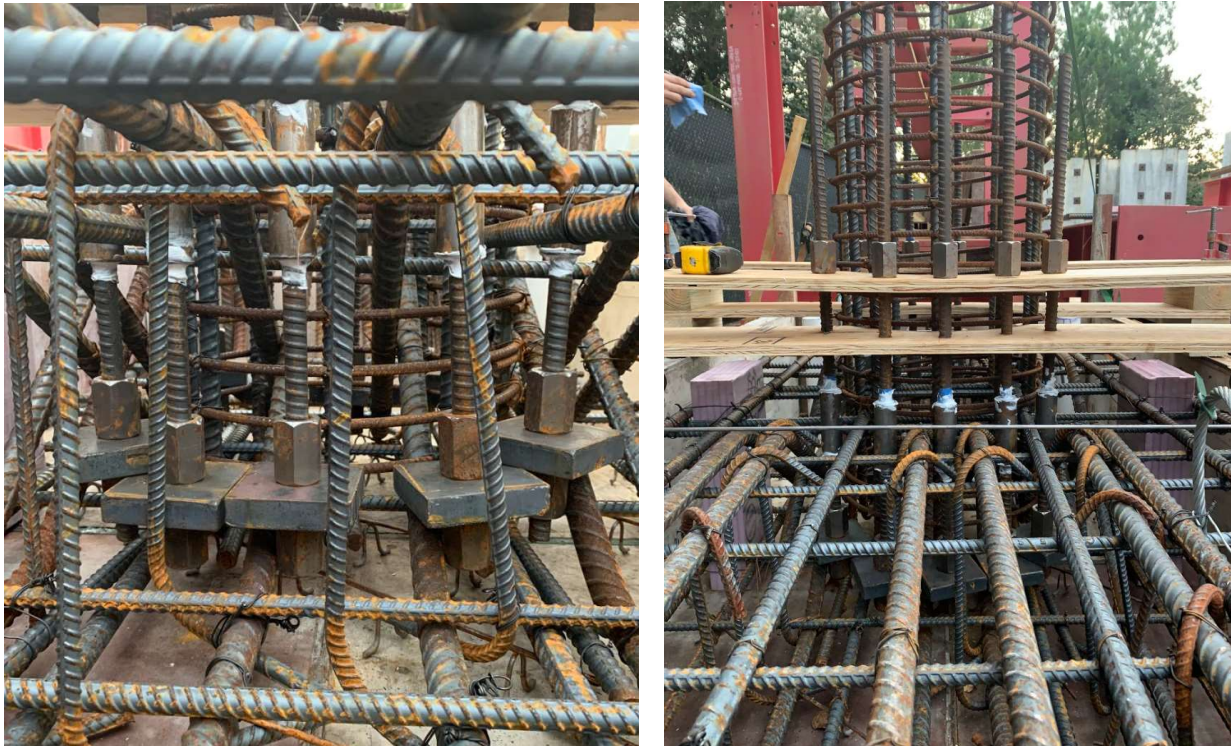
Repair Reinforcement Placed in Footing (left) and Formwork (right).
